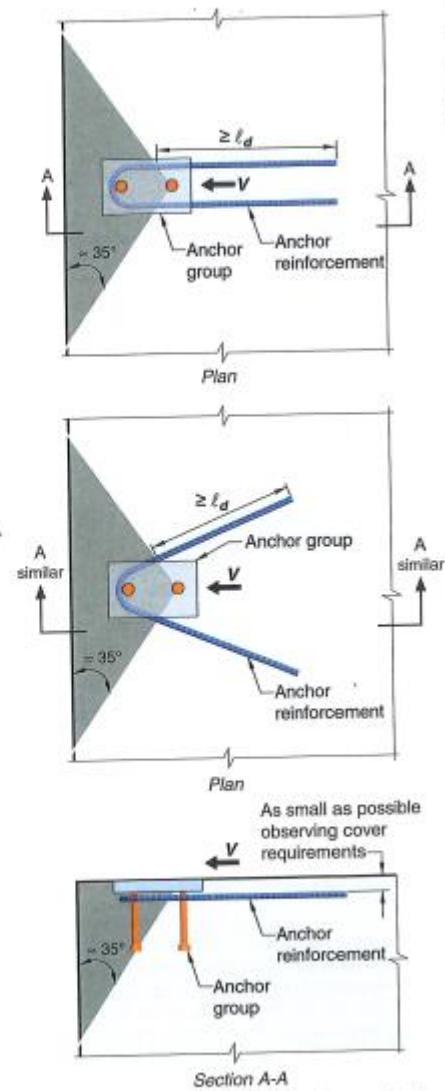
(i)—Hairpin anchor reinforcement for shear.
